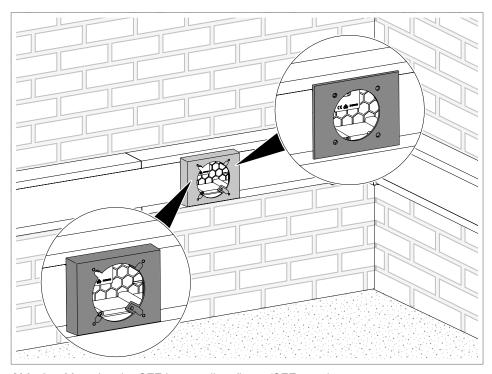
Mounting the CEE intermediate flange/CEE panel
